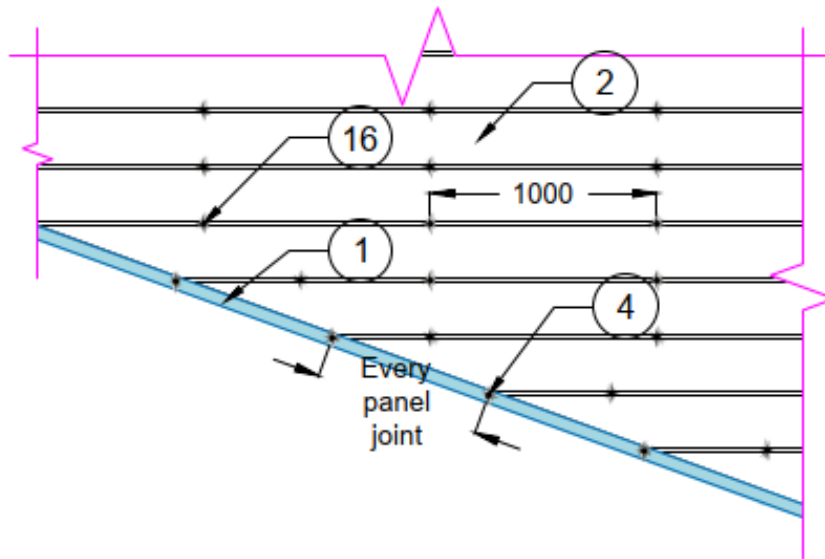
Horizontal Speedpanel wall connected to stair stringer (elevation view)
